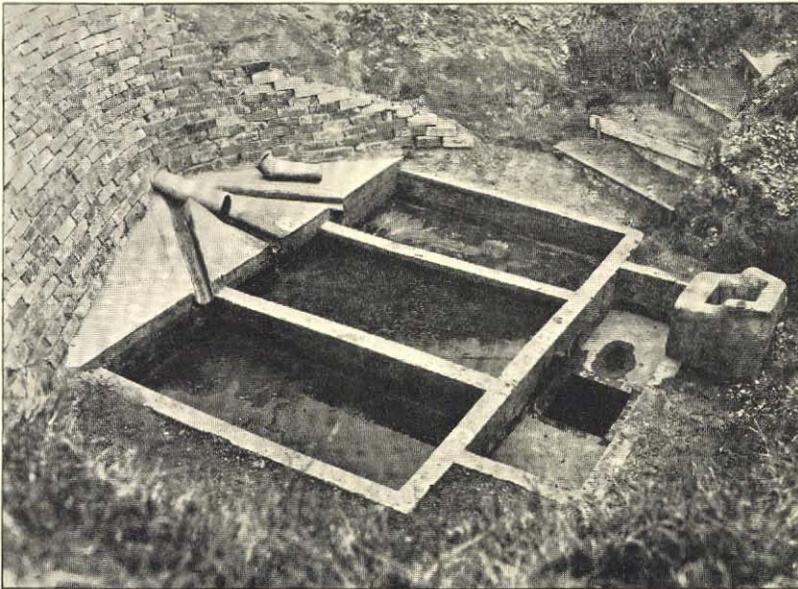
General view of sludge pits. By the use of a loose piece of tin piping, the sludge can be run into each pit in turn. The water, which drains off the top of the sludge, is bailed into the hopper shown on the right.
